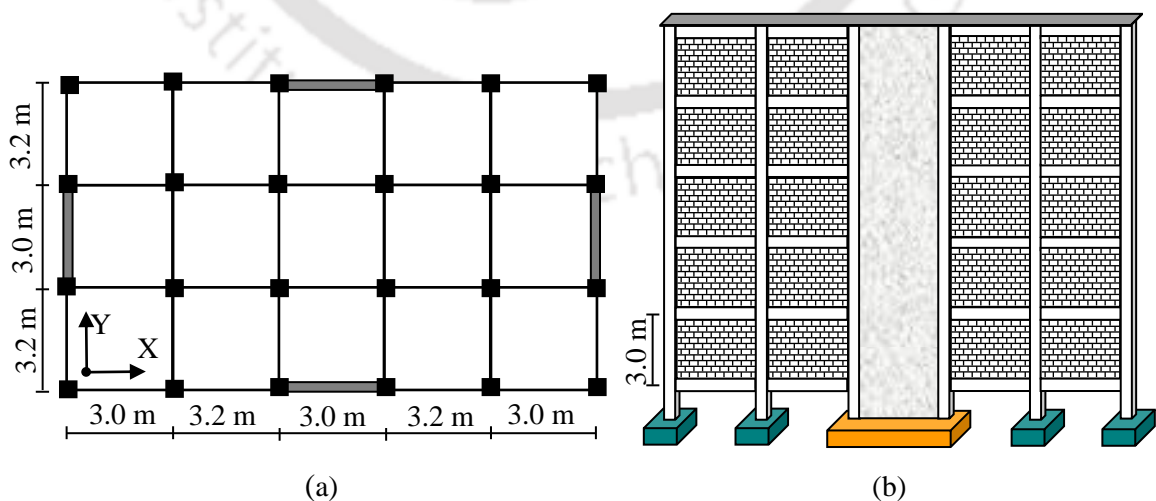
Details of buildings considered in the analysis: (a) plan (b) elevation.
